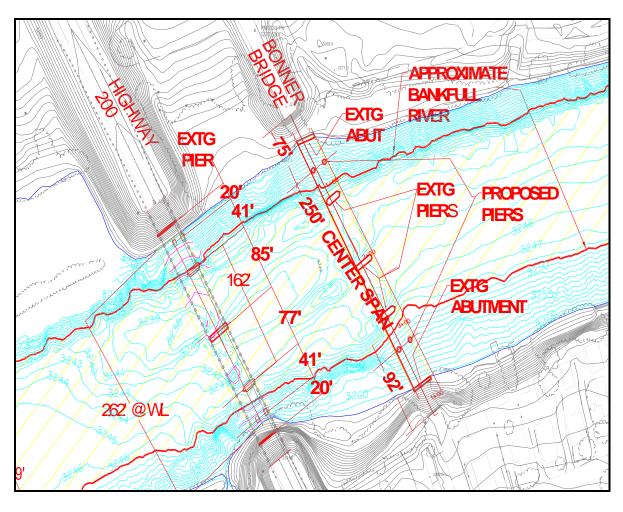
Plan view Of Blackfoot River Showing Three-Span Bonner Pedestrian Bridge And Highway 200 Bridge
